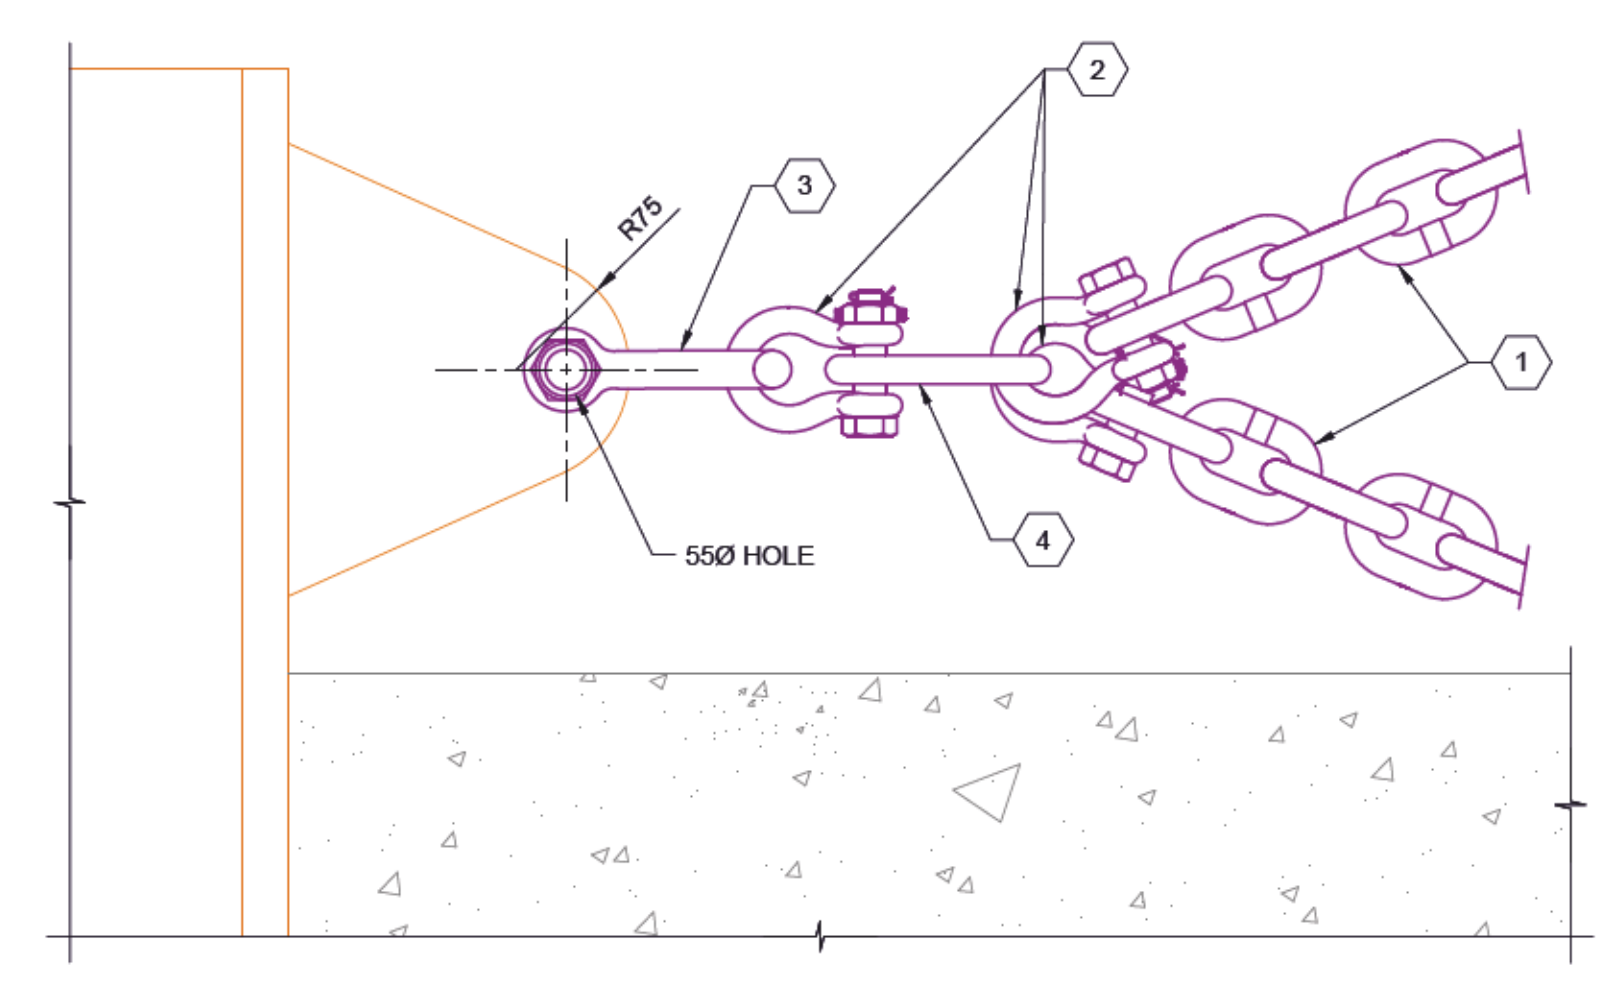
EXISTING BURIED CONCRETE ANCHOR BLOCK (A2 AND A3)
